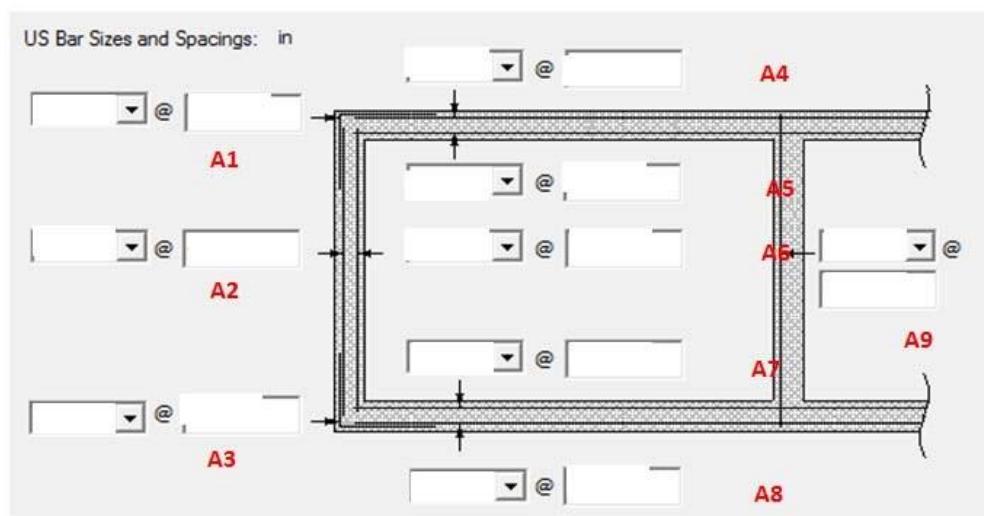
Designations of Bar Types for a Box Culvert
